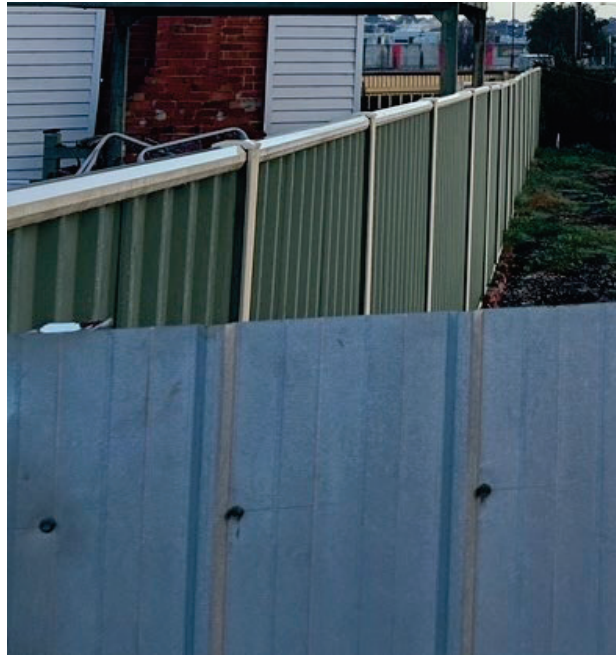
Existing Southeast fence to be matched on Northwest boundary
